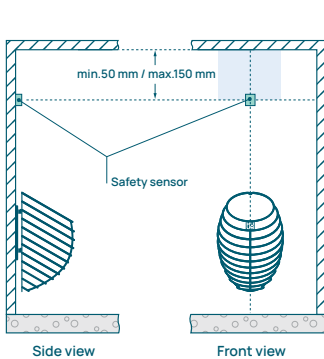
Installing the safety sensor on the wall: wall-mounted heater.
